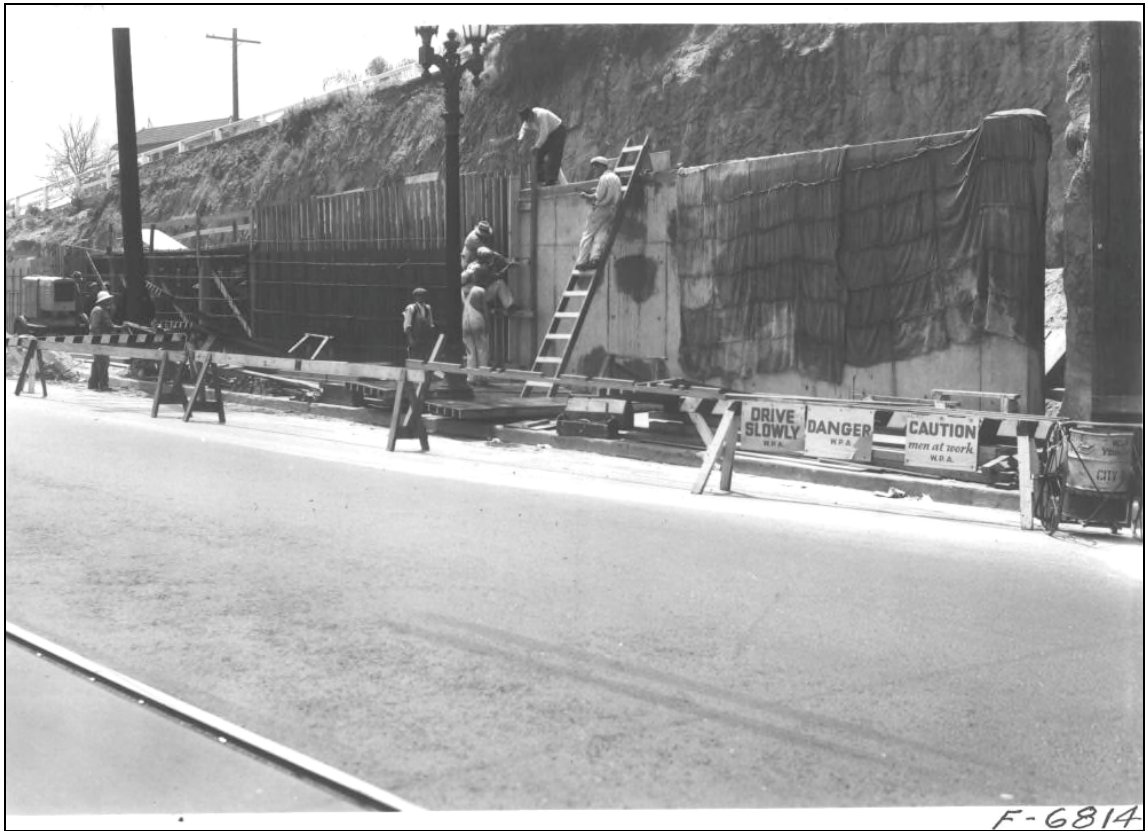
“Caution-Men at Work, WPA.” WPA Workers building the Sunset Boulevard retaining walls, 1940. Courtesy of the Los Angeles City Clerk’s Office.
